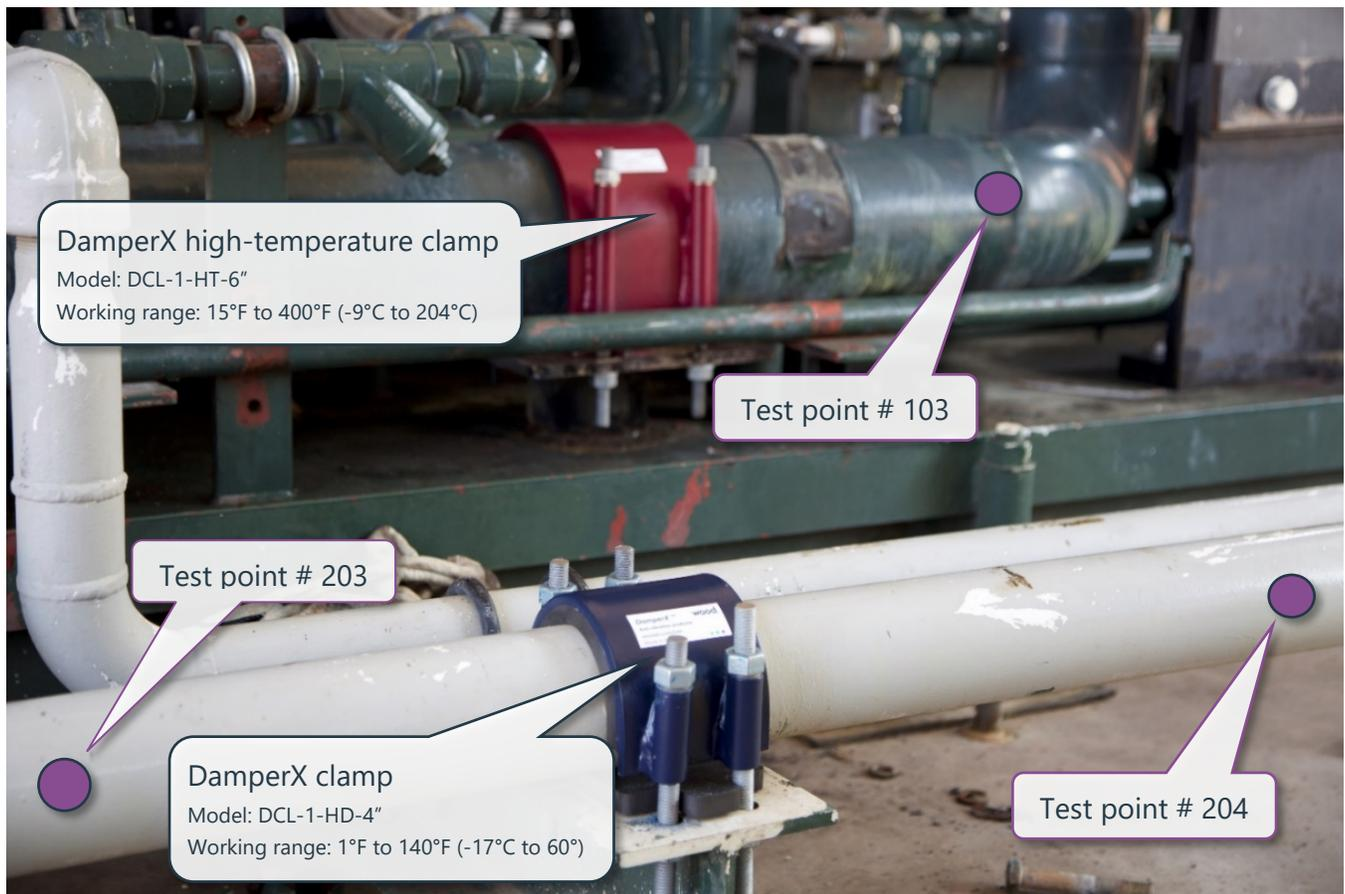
Main discharge pipe with DamperX clamps installed (TPs #203 and #204)
